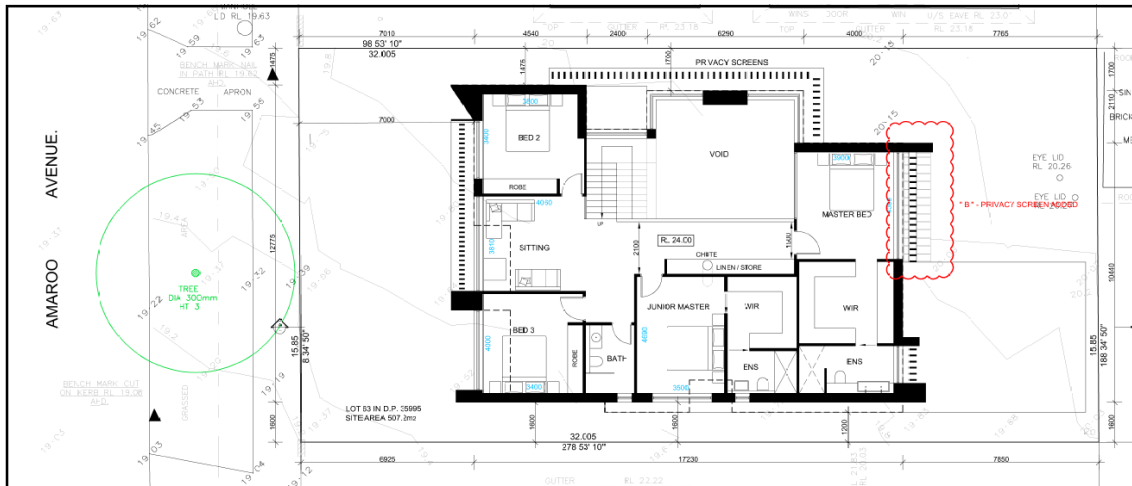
First floor plan 1364 – 02 Rev. B (IDAP assessed 29 April 2022)
